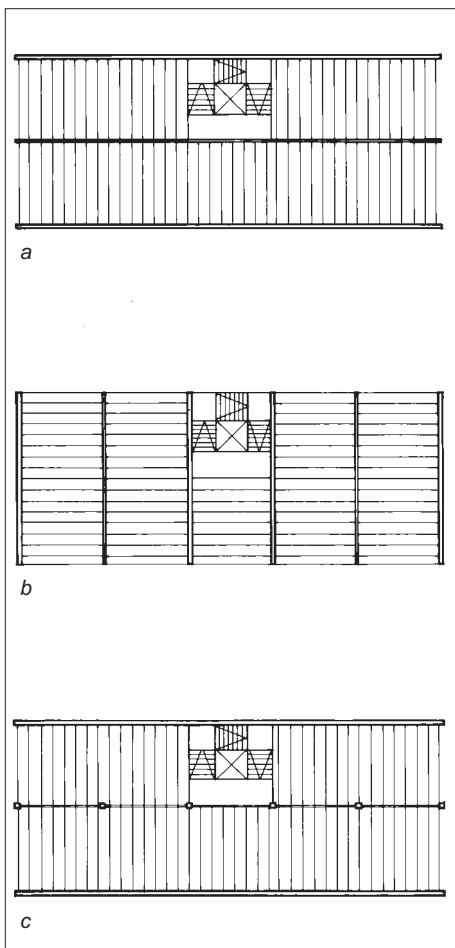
a, b and c. Joist layouts. Alternatives for apartment blocks
